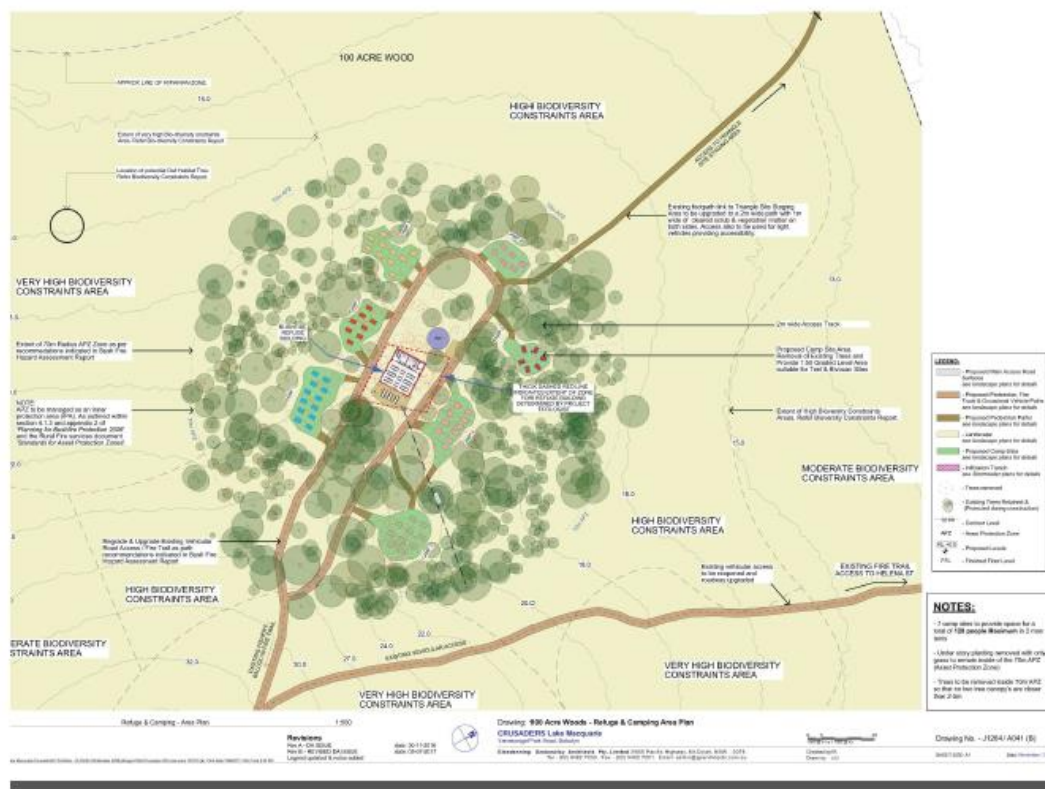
Detail of proposed camp on 100 Acre Wood site
